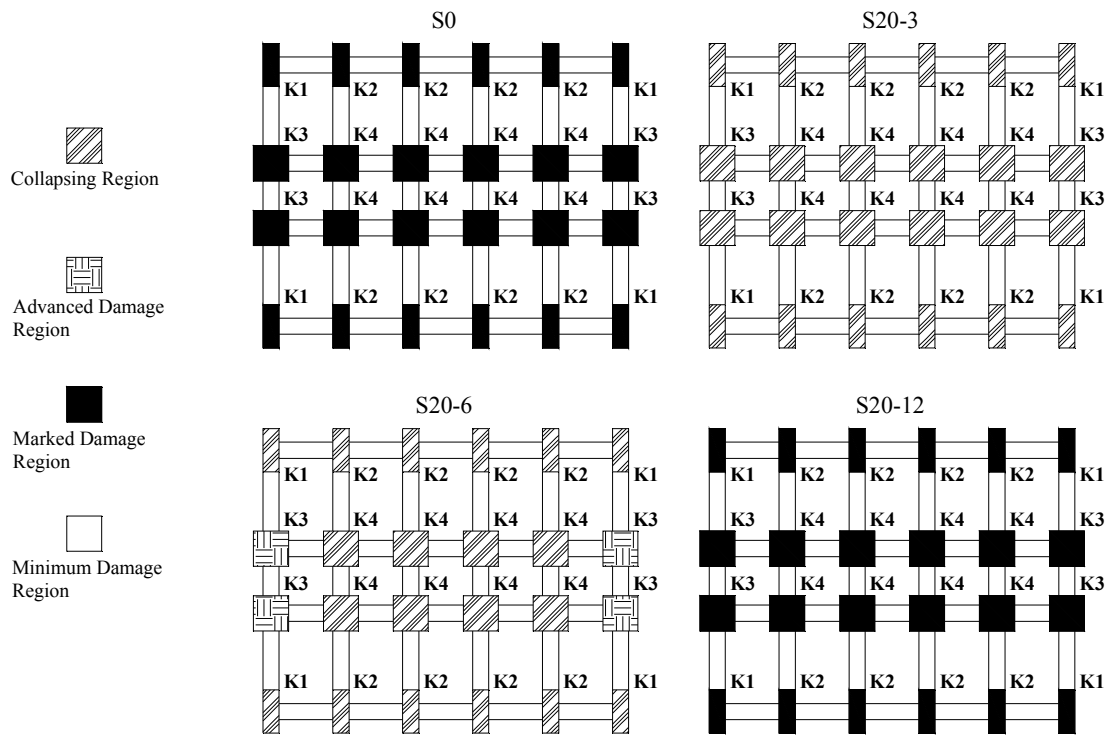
Damage levels of base columns of S0, S20-3, S20-6 and S20-12 buildings.
